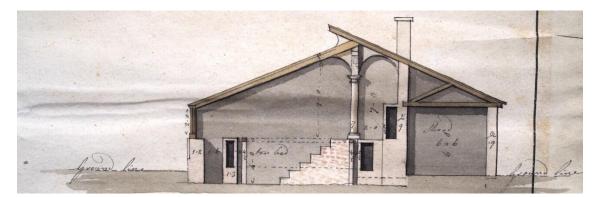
DETAIL OF 1758 STOVE PLAN SHOWING A CROSS SECTION THROUGH THE STOVE HOUSE, INCLUDING THE GANGWAYS, FLUES, SHELVES AND TAN BED (BURTON CONSTABLE HALL, 1758)
